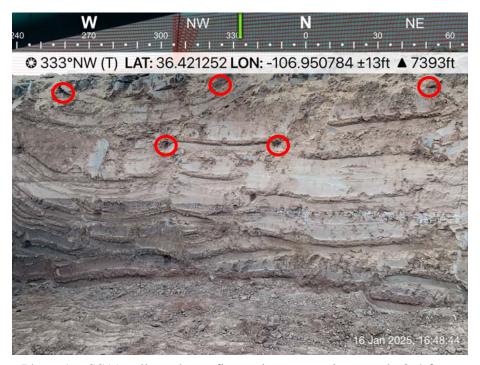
SS11 collected as a five-point composite sample 0-4 ft bgs from northwest sidewall of excavation.
